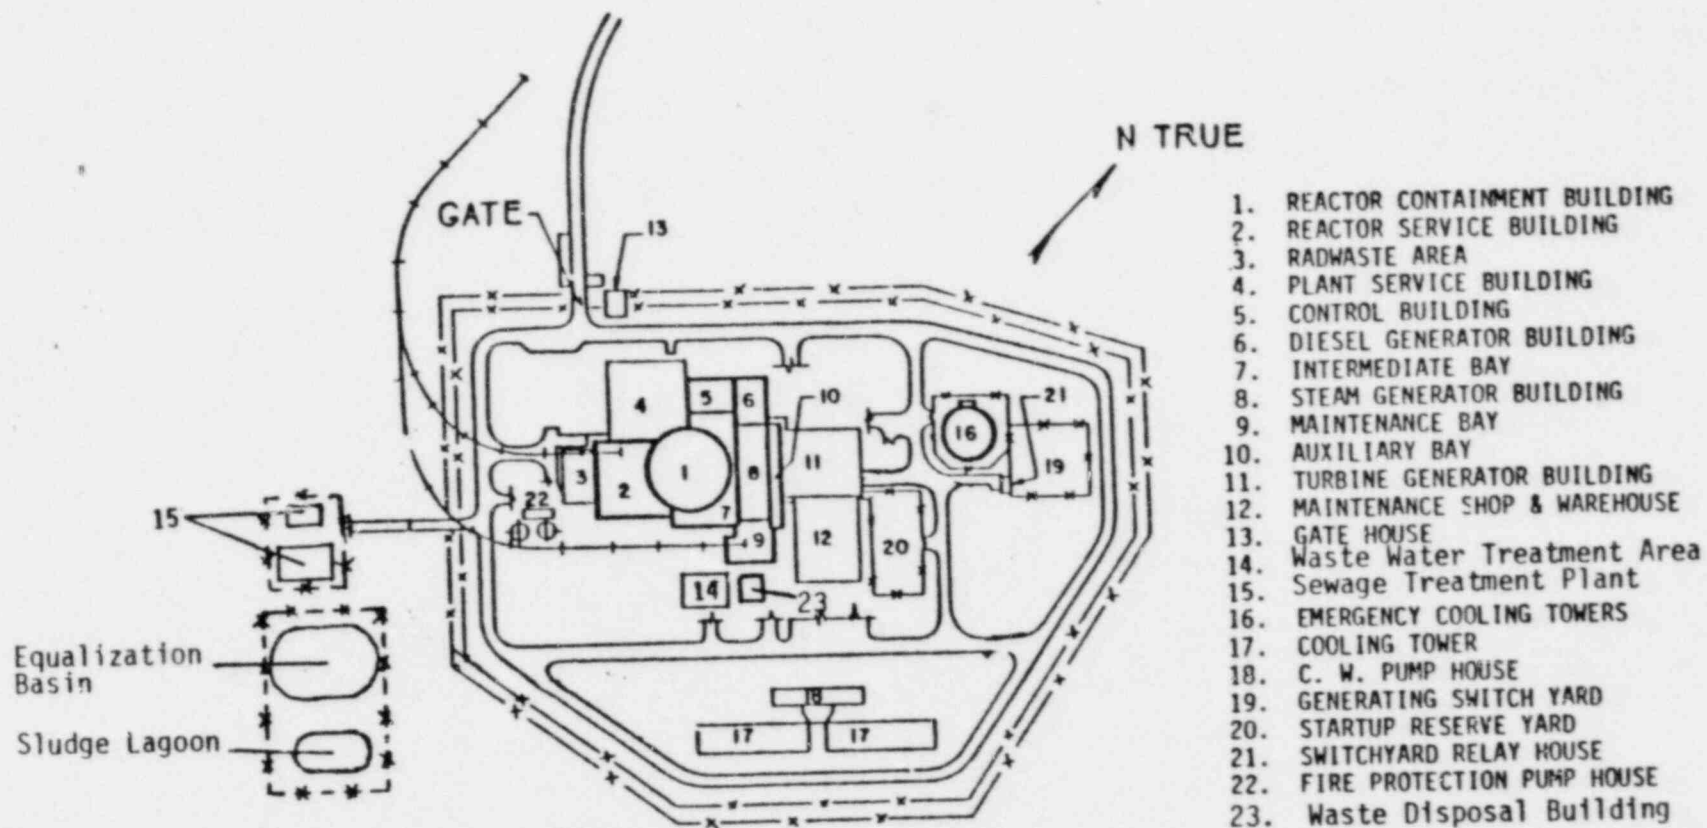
LAYOUT OF PLANT STRUCTURES
